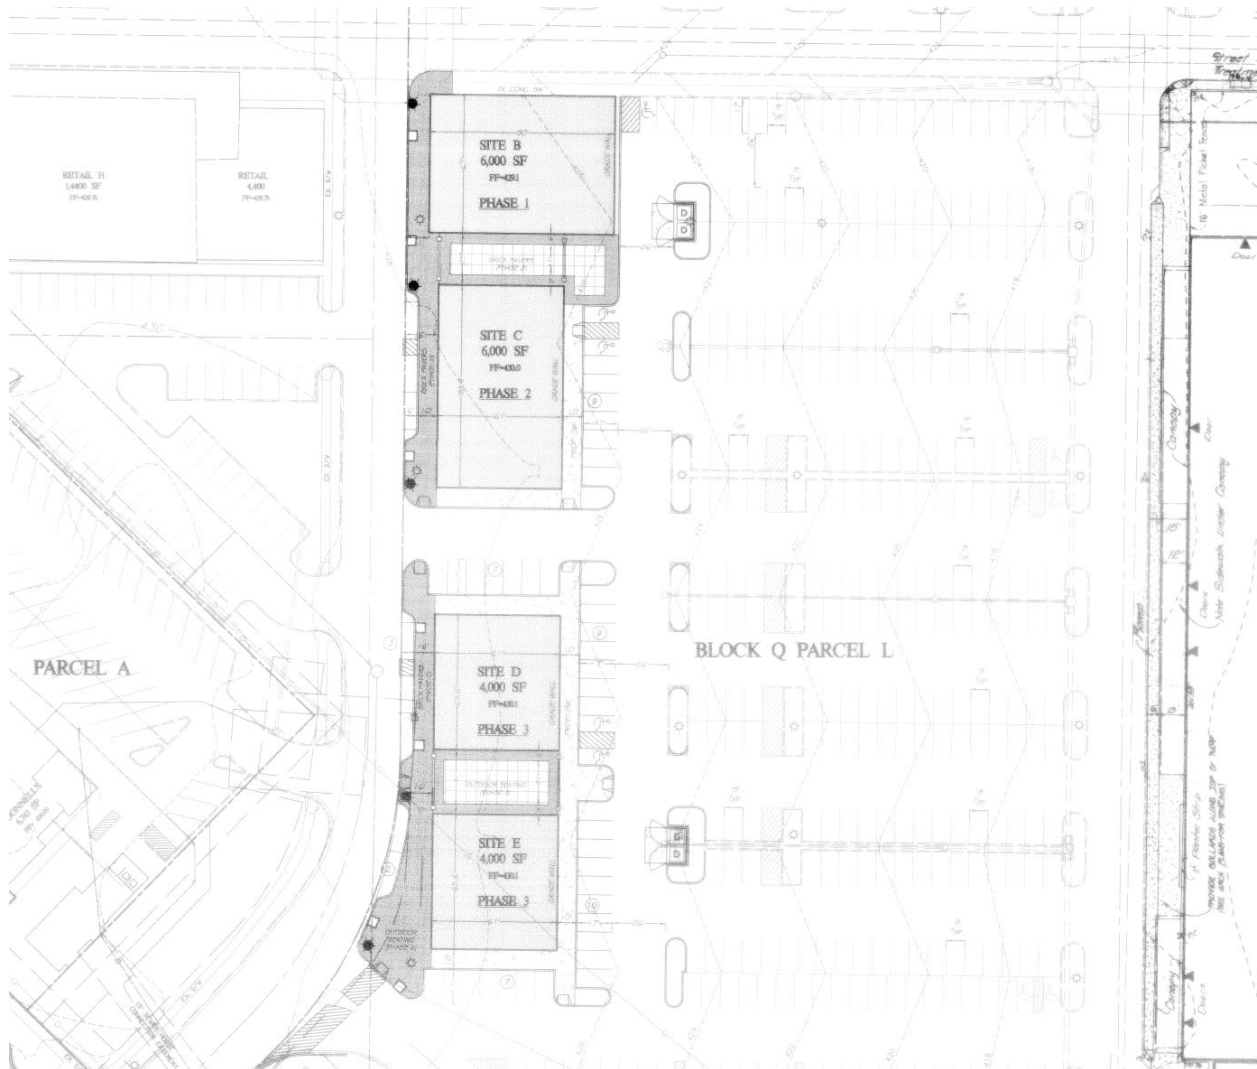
, SDP-03-005 – Site Plan (excerpt)
